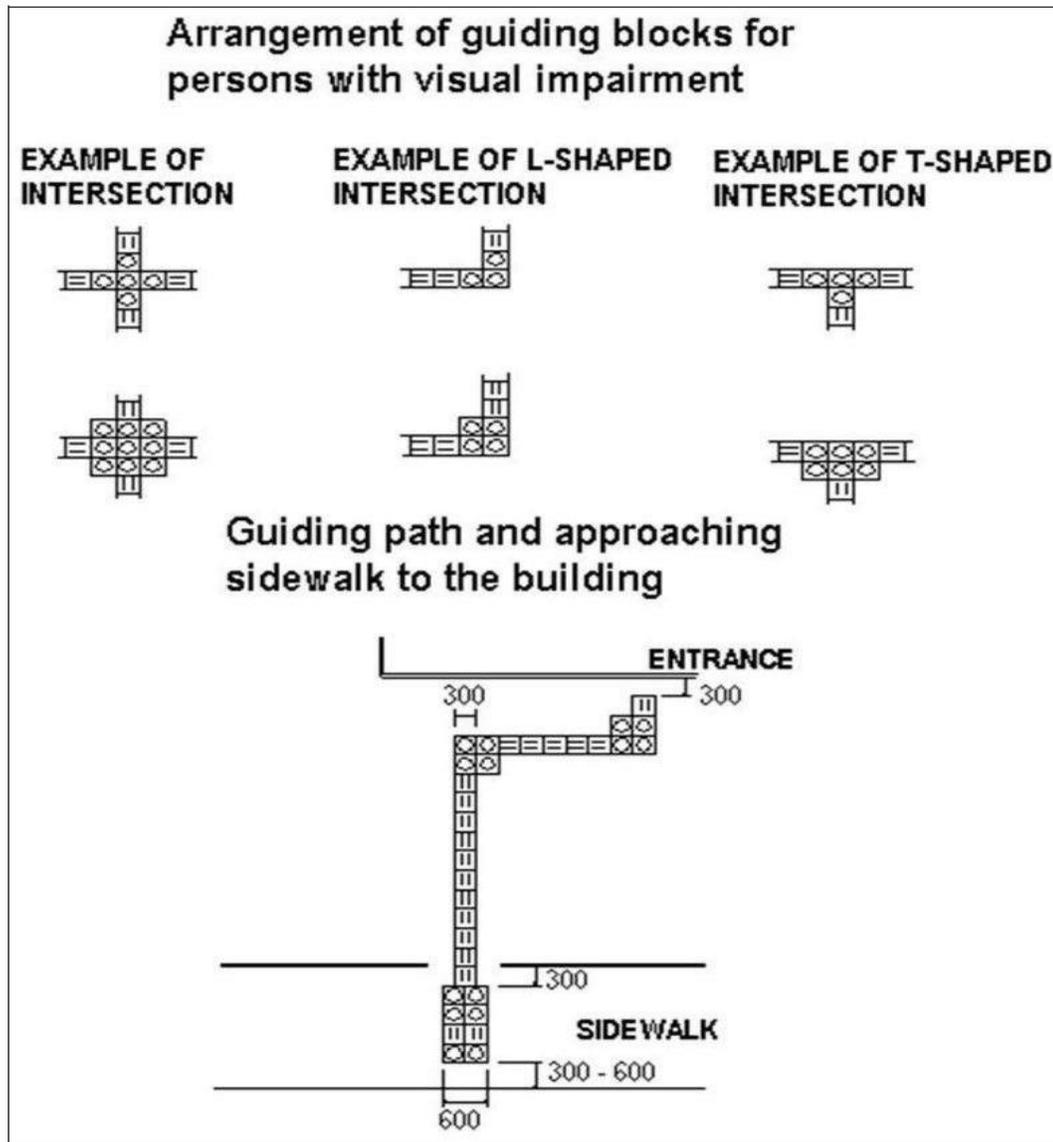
Configuration and layout of tactile pavers: (Guiding and Warning)
